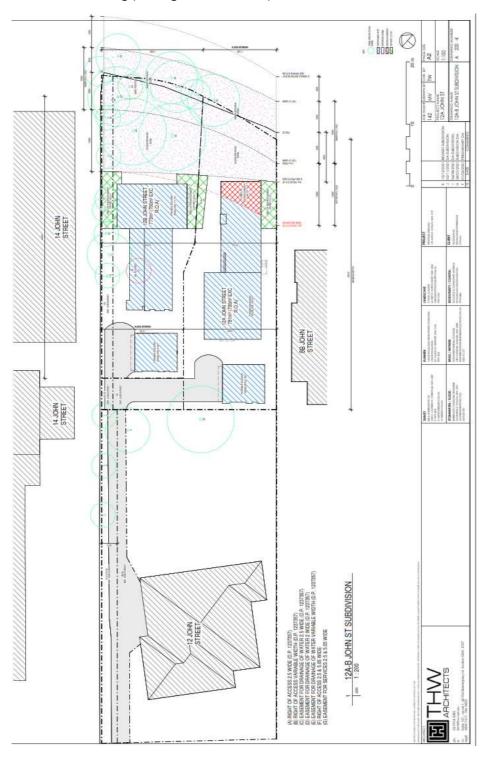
Site Plan for the proposal at 12A John Street, Avalon Beach NSW. Source – THW Architects,  $\mathbf{1}^{st}$  Feb 2021
